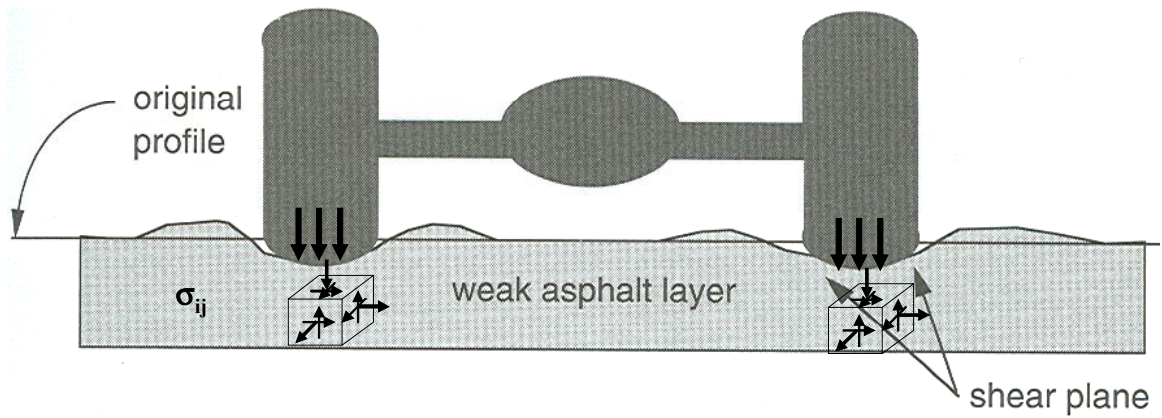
Rutting in Weak Asphalt Concrete Layer (After Superpave Mix Design 1996)
